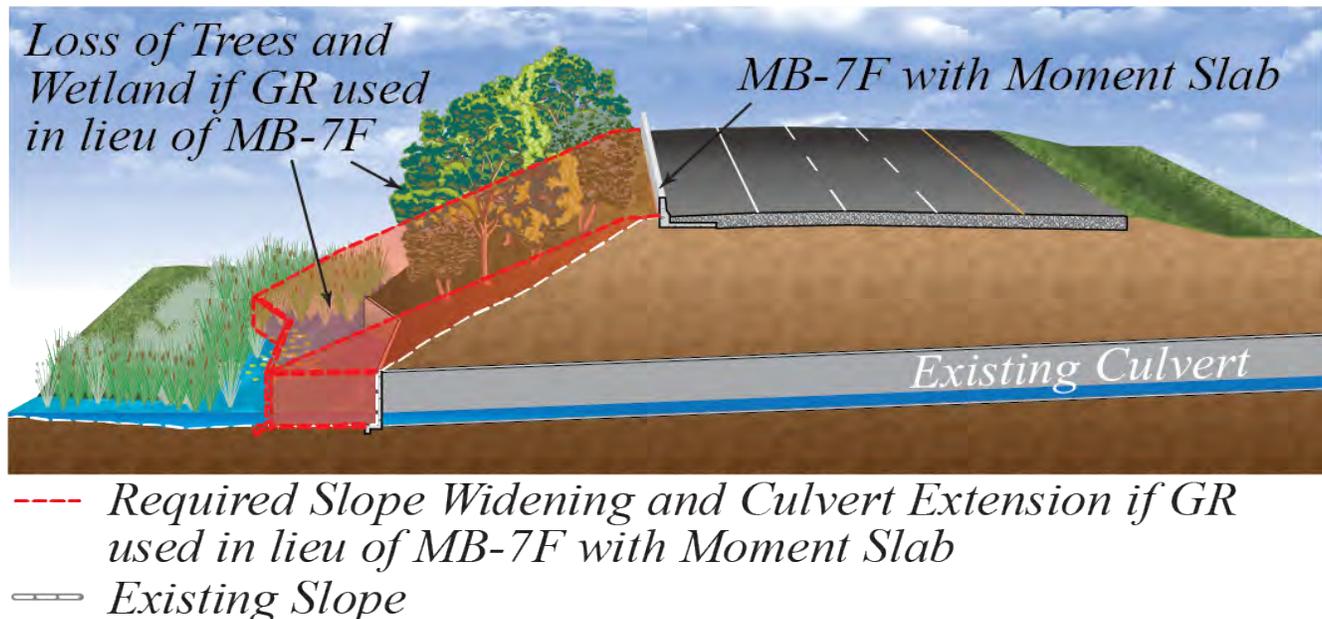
Utilize a Concrete Barrier at Shoulder. Our design uses a moment slab and barrier system to widen the roadway without the fill slope impacting the existing headwall or wing wall.
